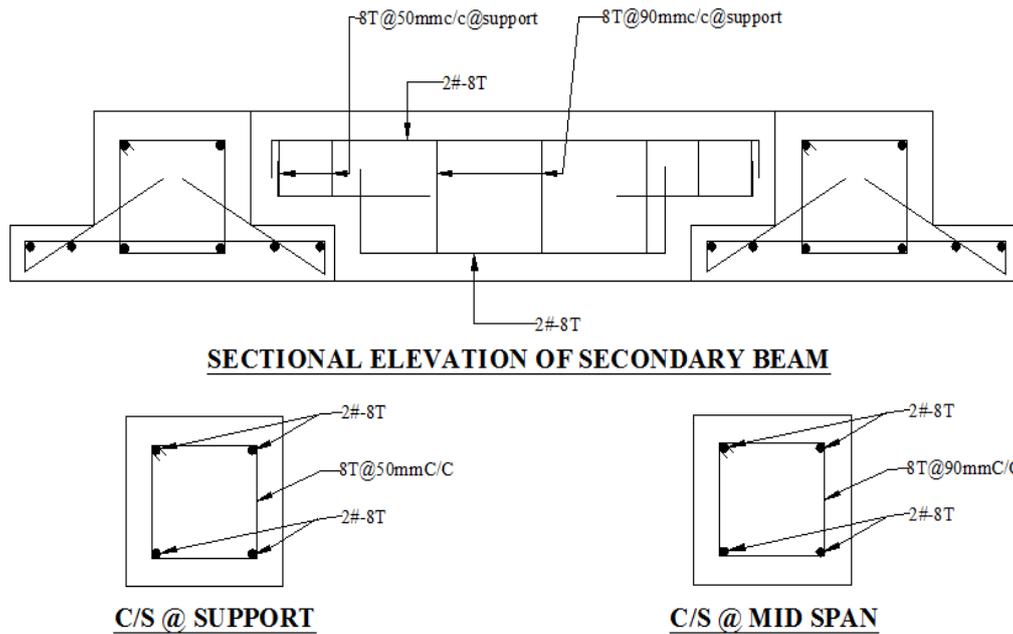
Typical reinforcement of secondary beam resting over the brackets of the primary beam
